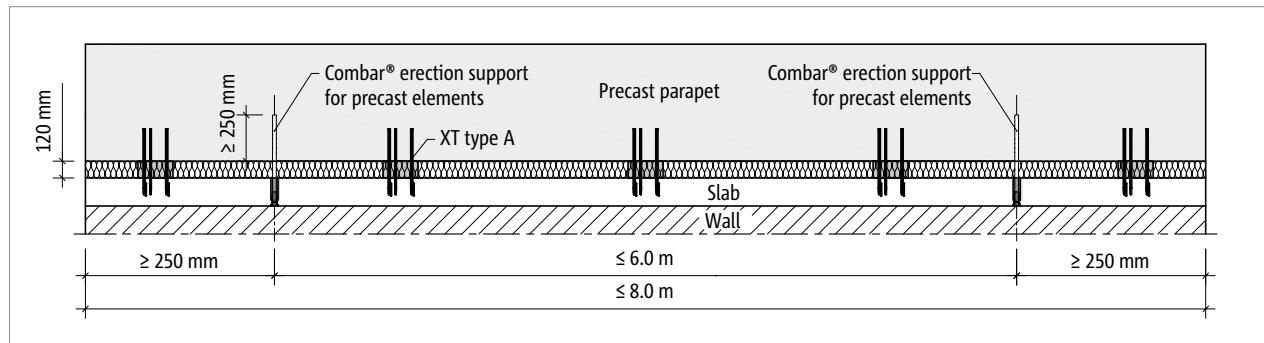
Schöck Isokorb® XT type A with Combar® erection support for precast elements: Edge distance and minimum bond length in the prefabricated parapet
